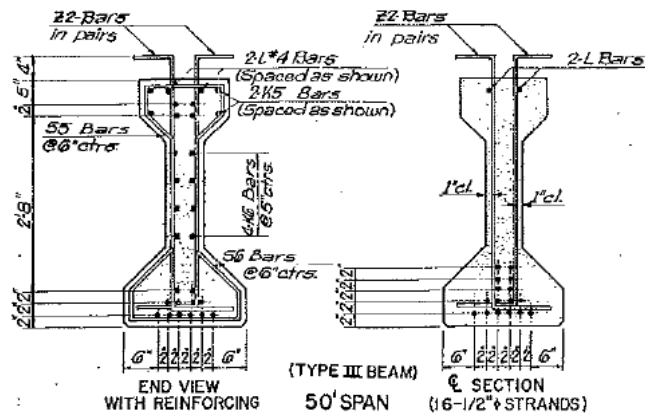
Superstructure girder details. Taken from FAS Project No. R.S. 1910(103) plans.
